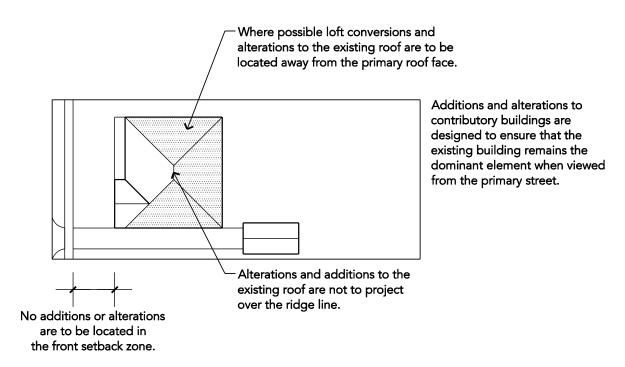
Plan illustrating compatible and incompatible roof conversions – Griffiths Architects 2012.
